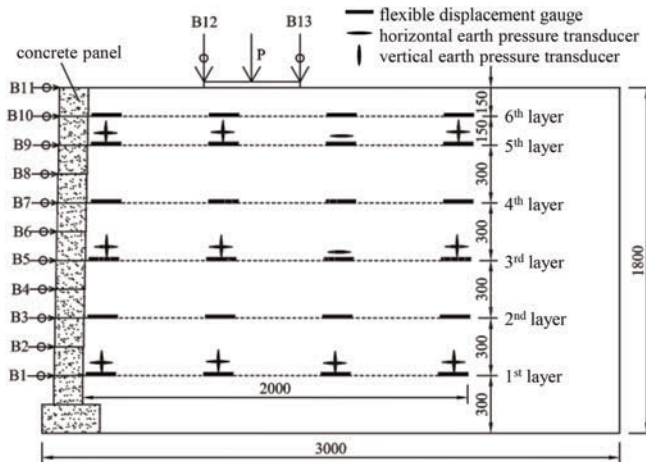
Sketch of reinforced soil retaining wall model test (unit: mm) (after Wang *et al.* 2016).
